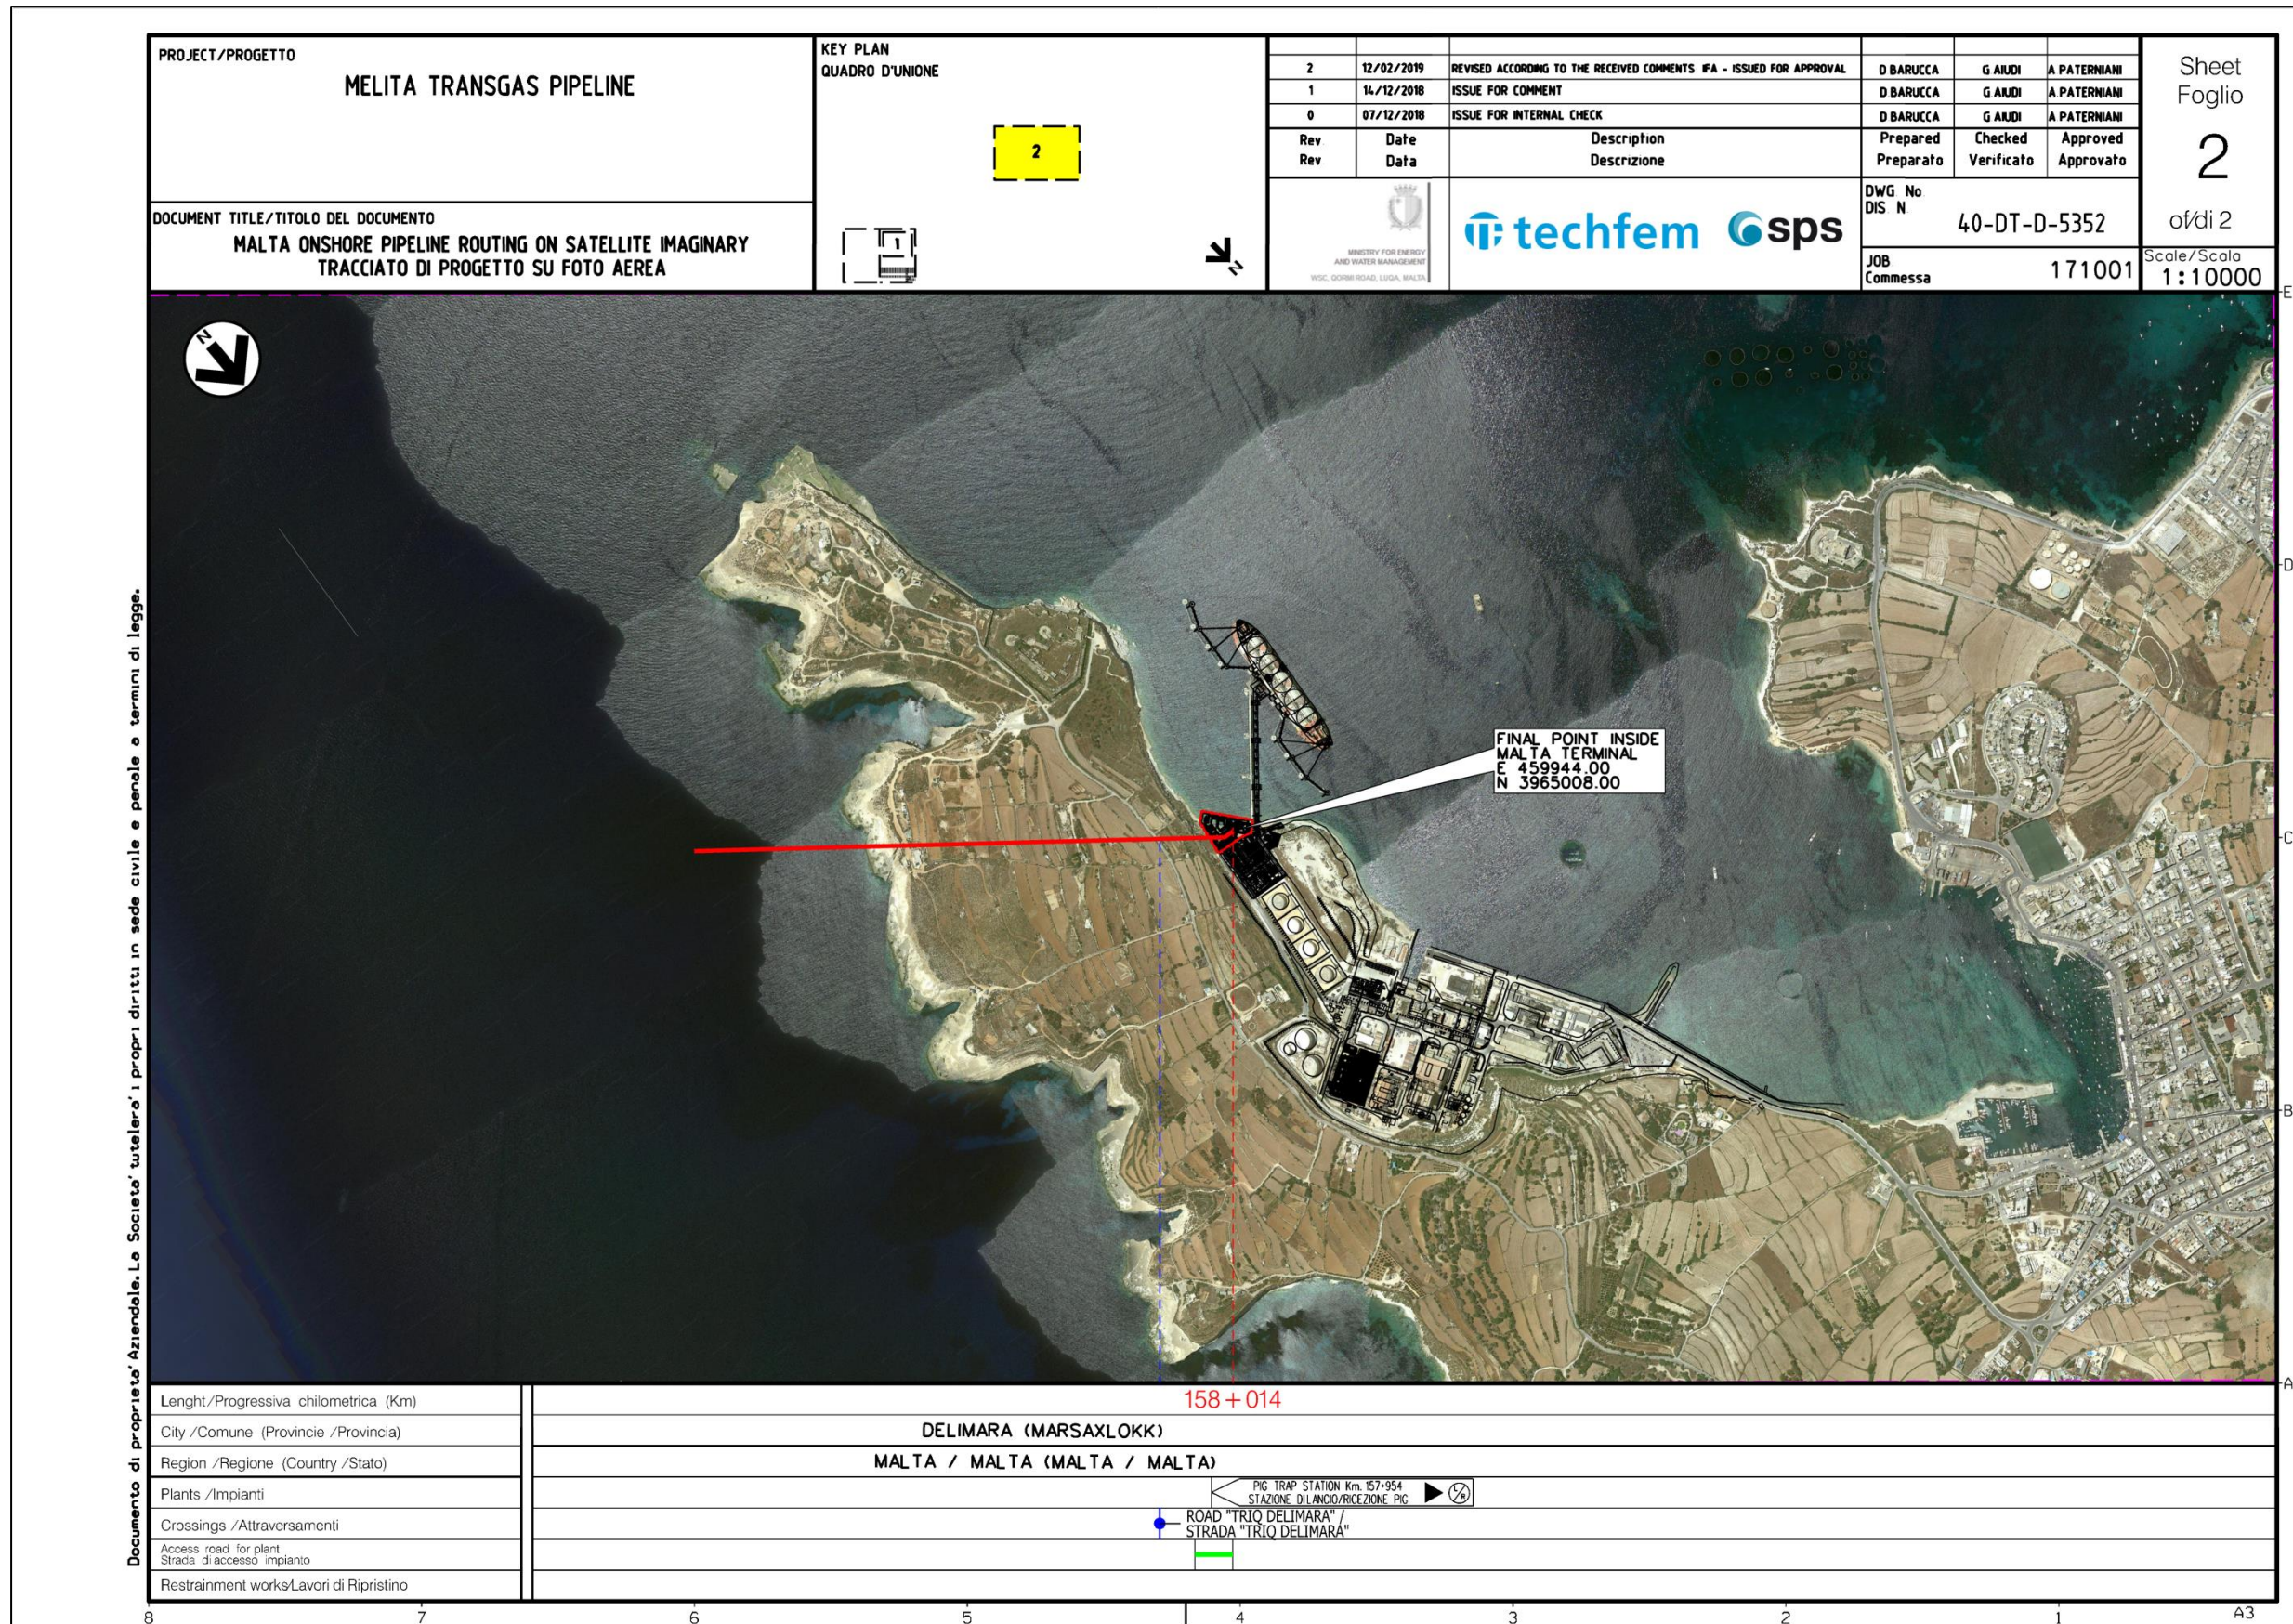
Area image showing location of underground pipeline crossing Delimara peninsula and Terminal site.
